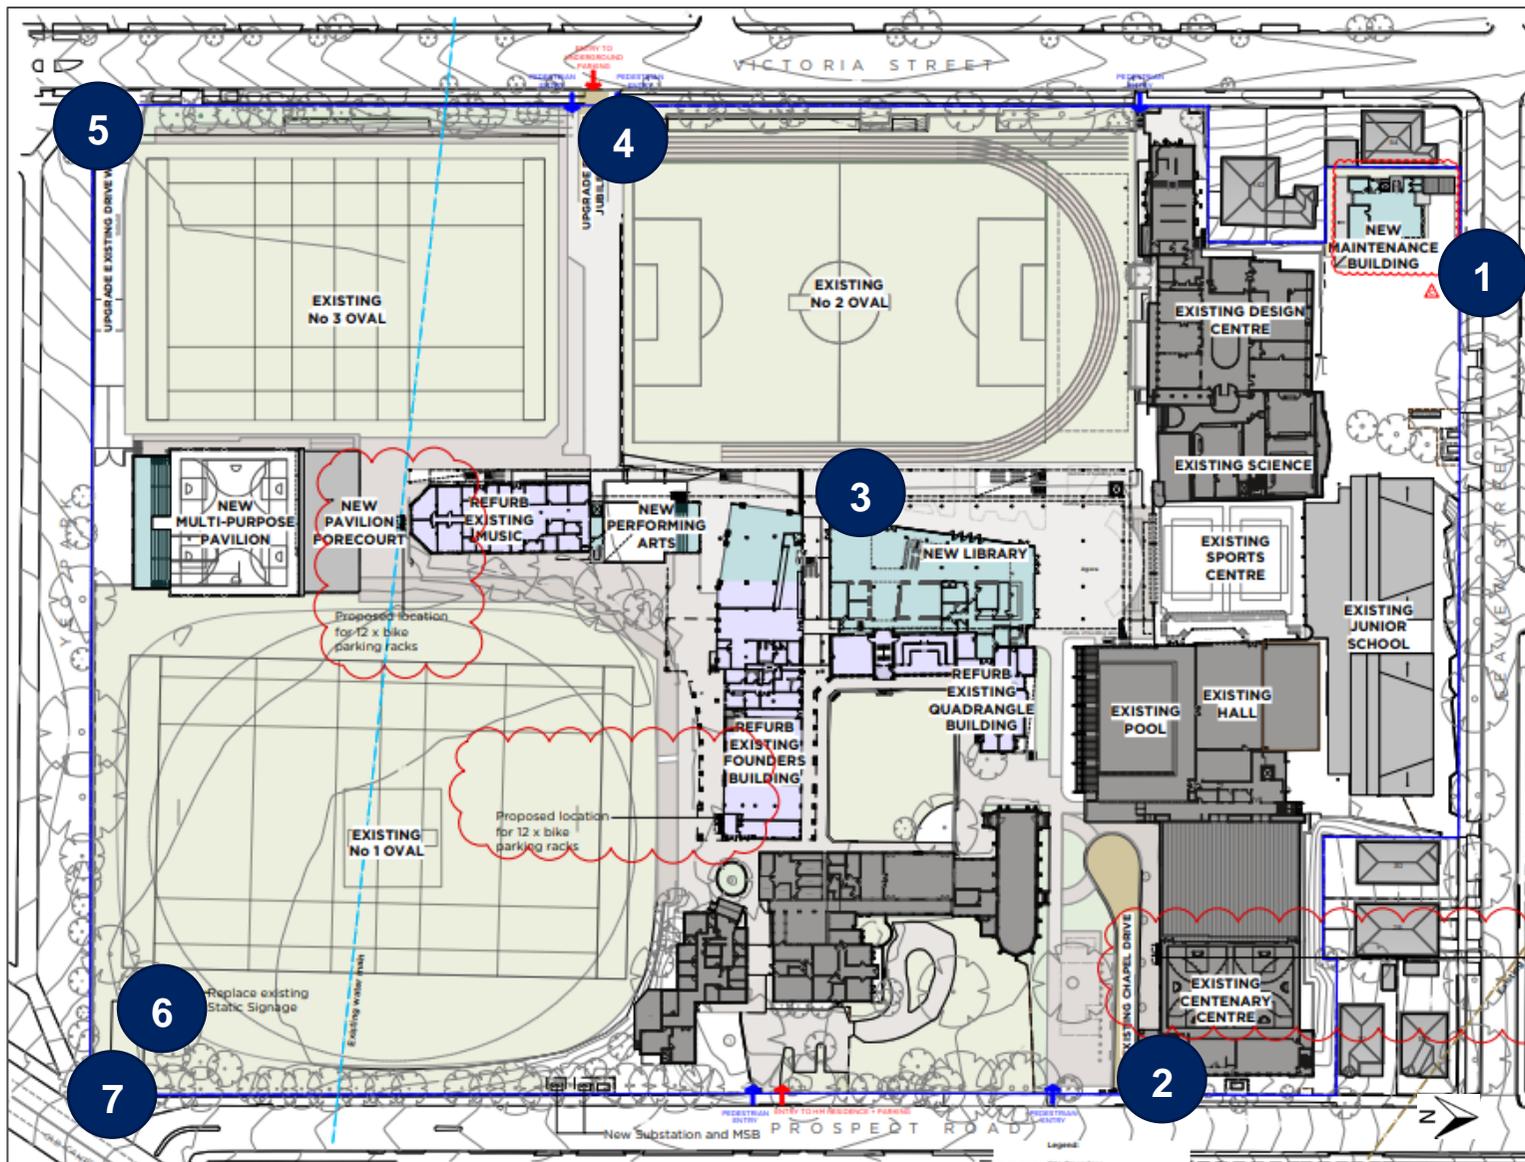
| Proposed ground floor plan showing circulation paths and signage locations numbered (Source: Applicant's SRtS 2021)
